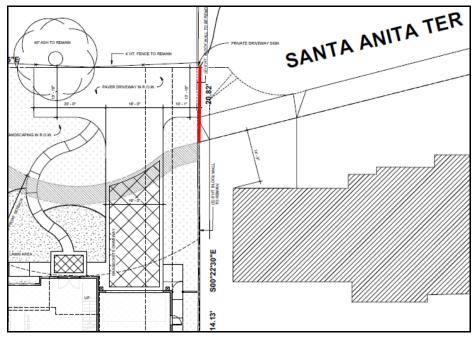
Proposed Hammerhead Driveway Existing Wall to Be Removed
